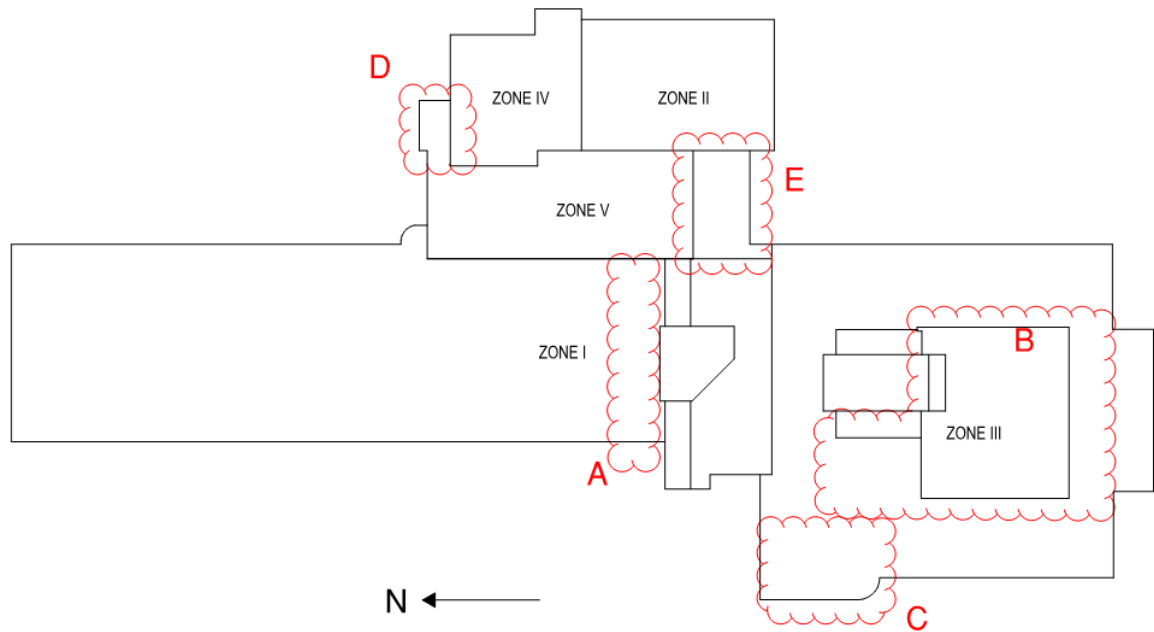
Pre-Reroof Gravity Upgrade Locations, Plan View
